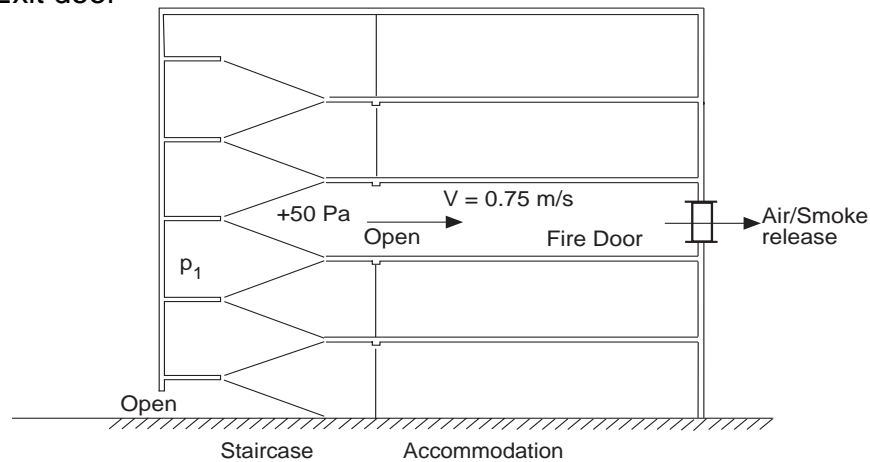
AIRFLOW THROUGH OPEN EXIT DOOR
